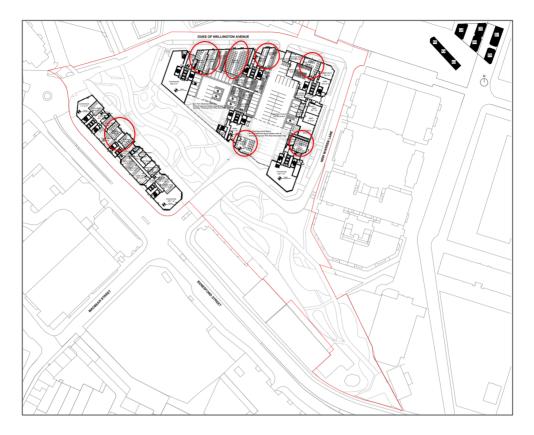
Refuse Store Locations on Proposed Site Wide Ground Floor Plan (PRP, February 2024)
